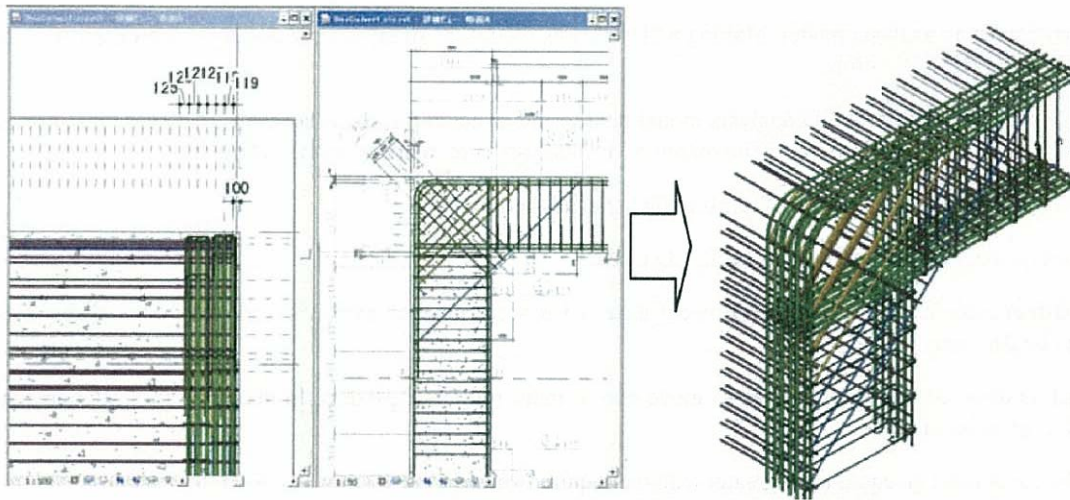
Making a 3D reinforcing bar model from 2D drawings using the proposed approach
